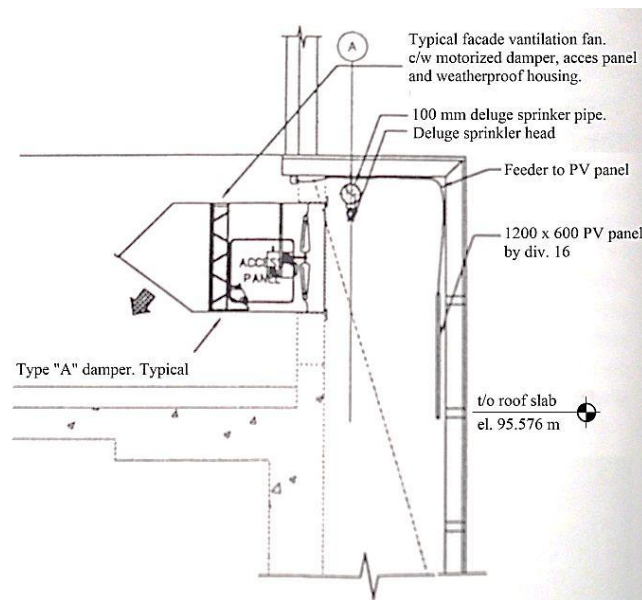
Architectural detail of fan / PV module layout of William Farrell Building, Canada, Vancouver (Prasad and Mark , 2005).
